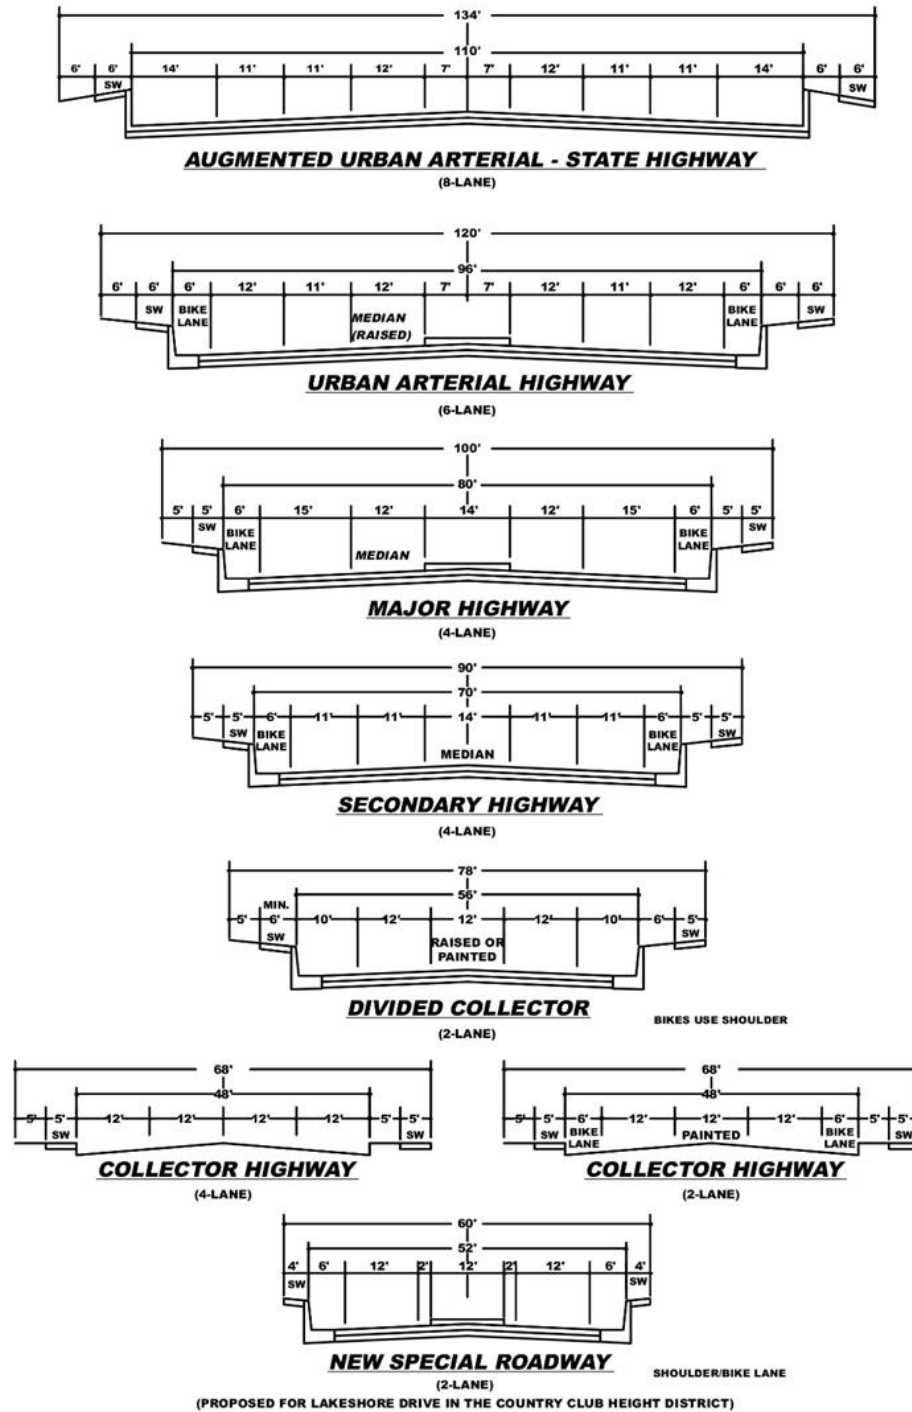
COUNTY OF RIVERSIDE GENERAL PLAN ROADWAY CROSS-SECTIONS
